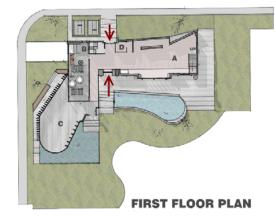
Plan Development. Initial design development. A variety of issues exist with this layout, including awkward washrooms, egress, natural lighting, and furniture layouts.
